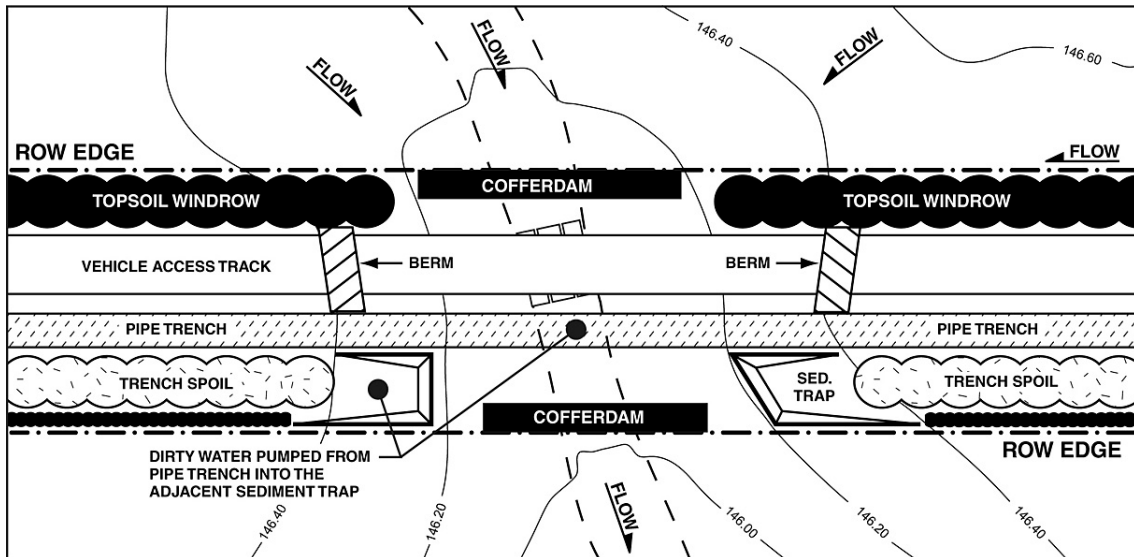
Typical ESC control measures for a waterway crossing while the pipe trench is open
